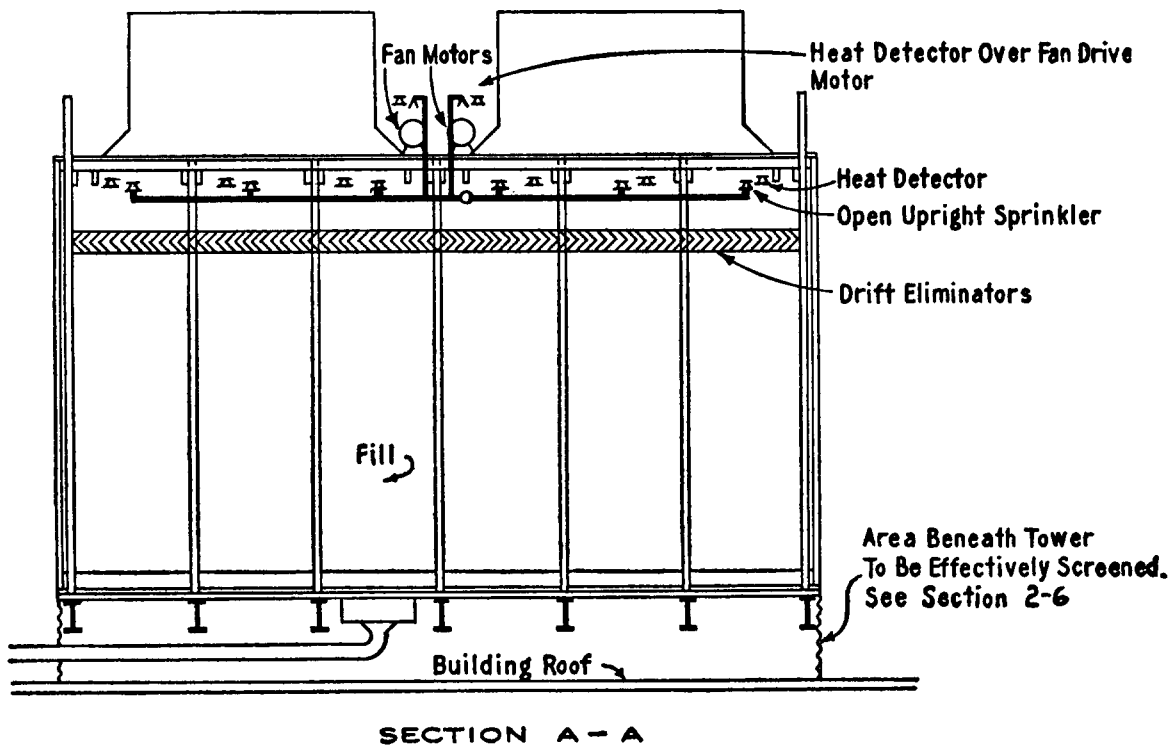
Typical deluge fire protection arrangement for counterflow towers.
